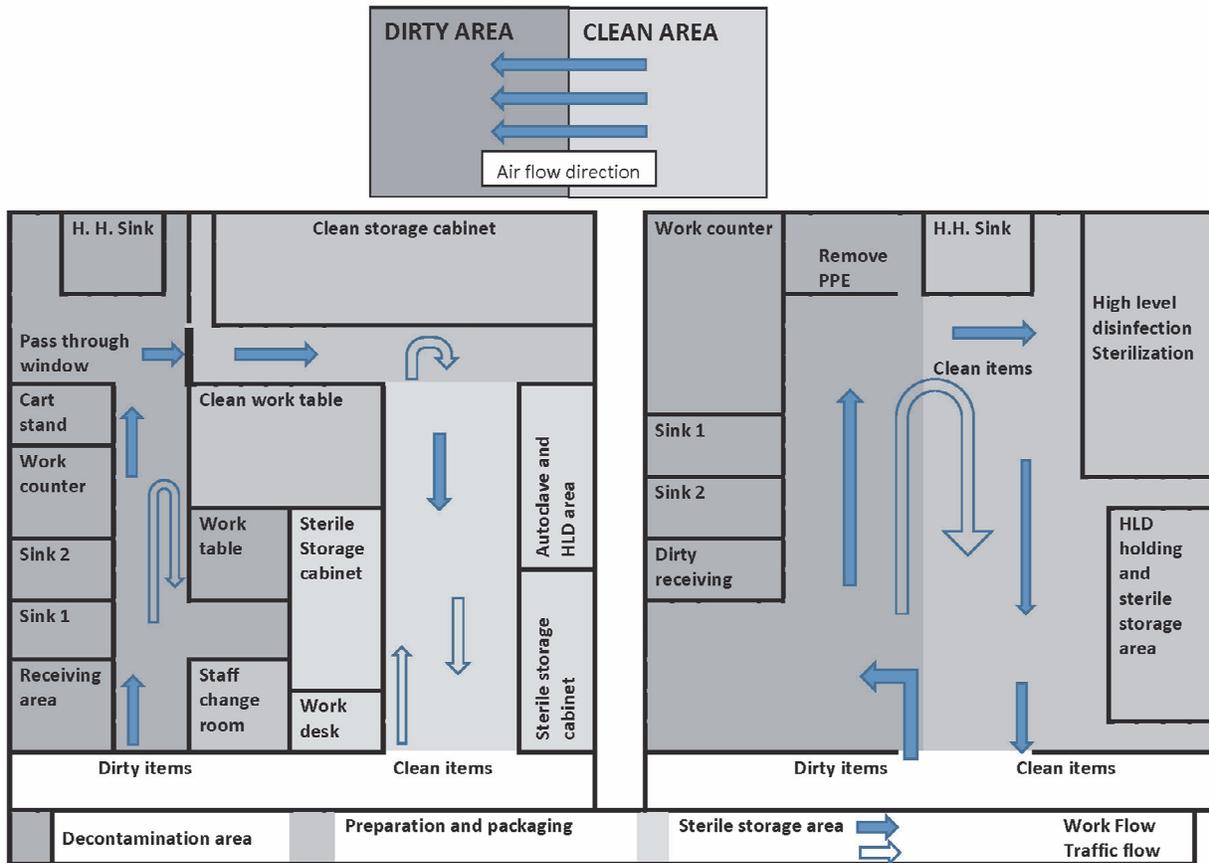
A and B. Floor Plans for Instrument Cleaning, High-Level Disinfection, and Sterilization Areas in a Clinic and Larger Facility
